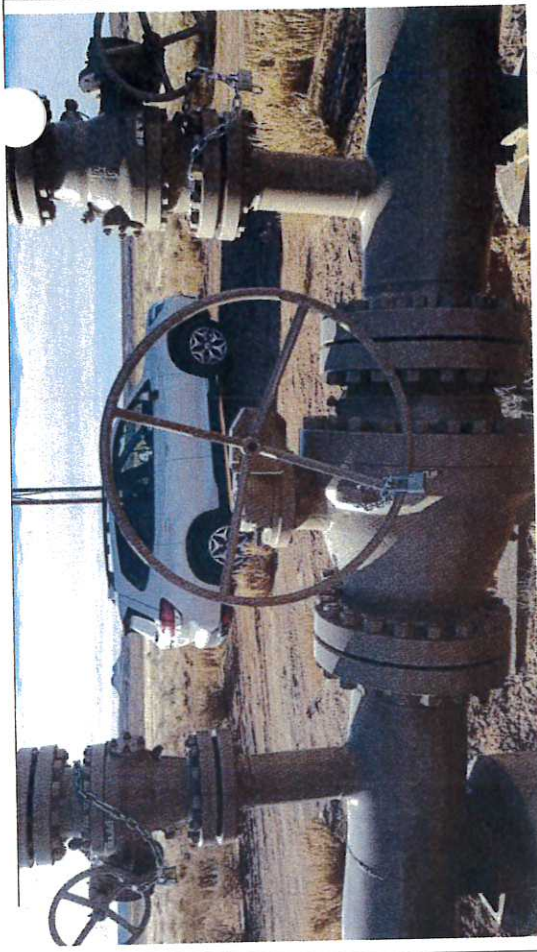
Block Valve BV-10, observed in close position with chain and lock.
